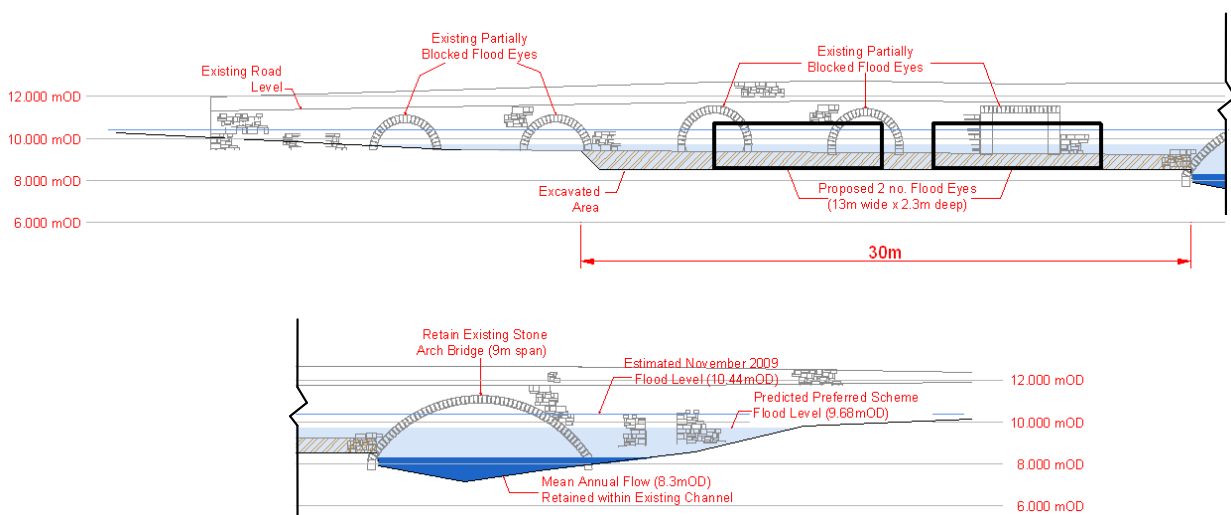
Proposed Works at the Dunkellin Bridge
